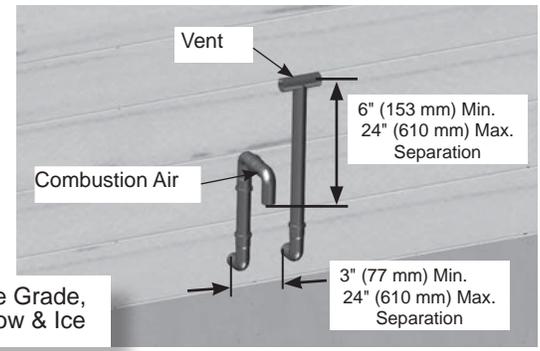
Twin Pipe Side Wall Vent (Multiple Appliances)
